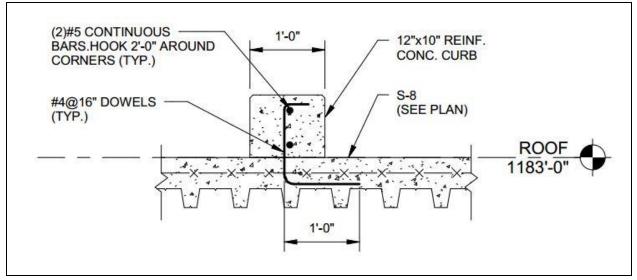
Typcial Equipment Curb Detail (Courtesy of Stantec)
